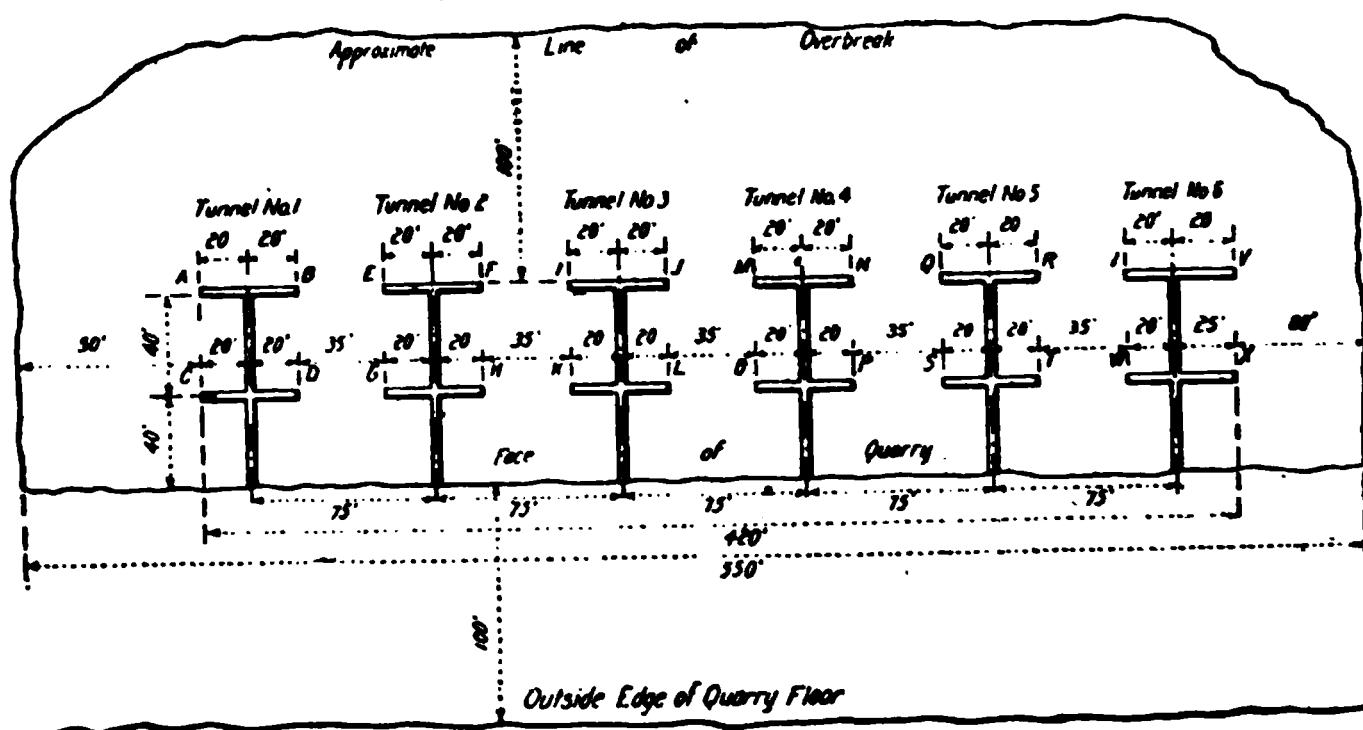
Plan of Location of Tunnels for a Large Blast.
